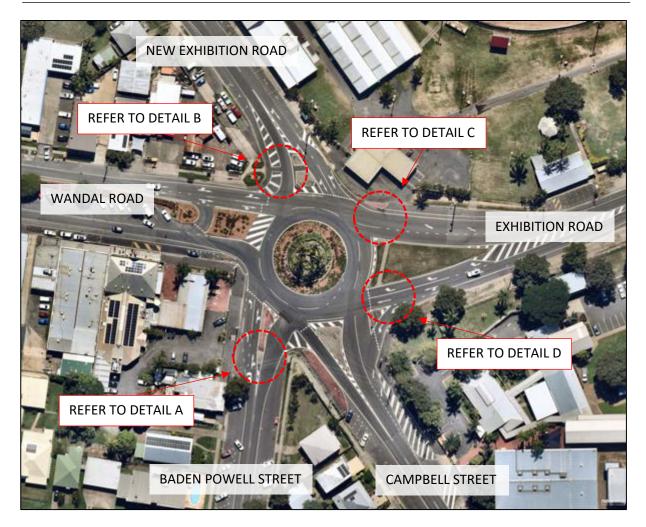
AERIAL OF THE CAMPBELL STREET / WANDAL ROAD / EXHIBITION ROAD INTERSECTION
